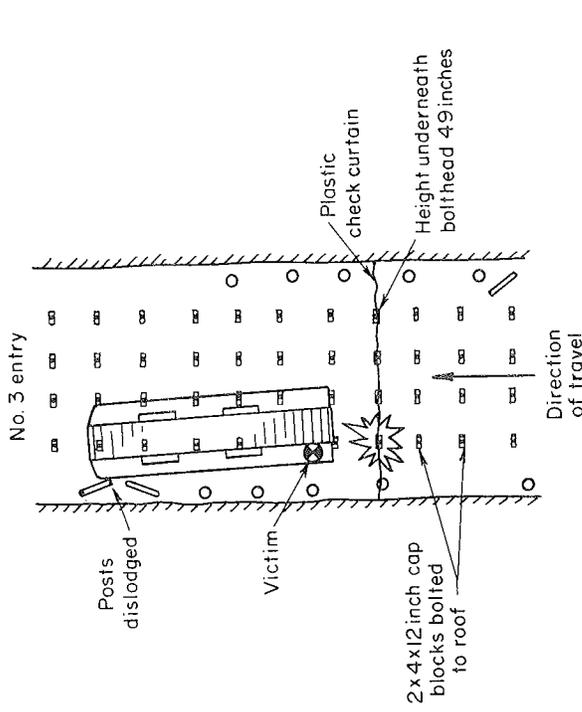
Trimming self-propelled equipment through check curtains.
